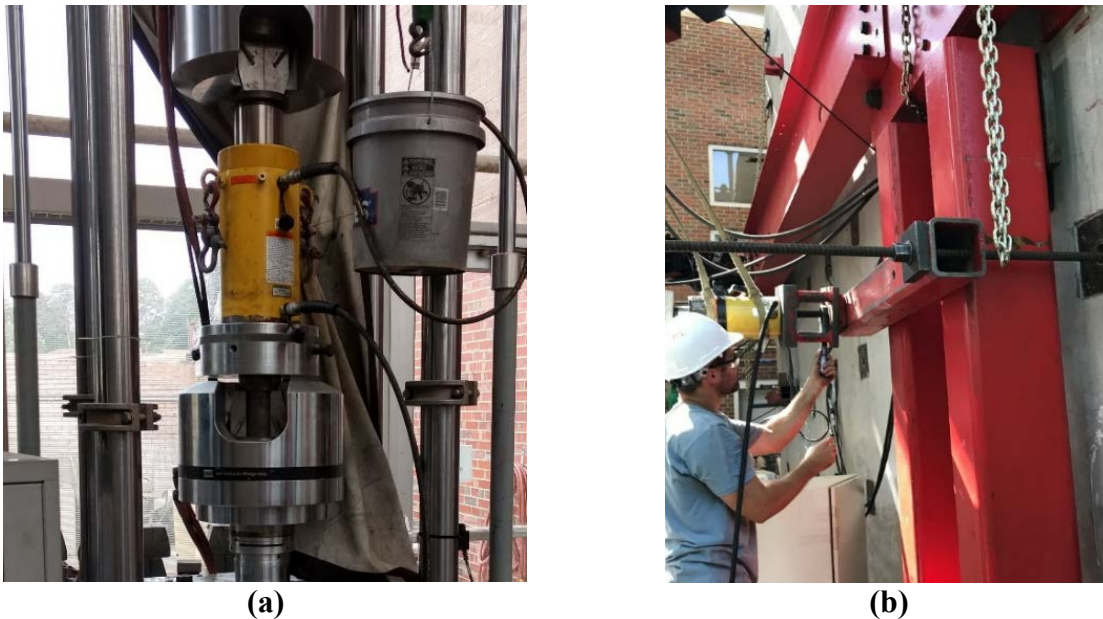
(a) 200-kip hydraulic jack in MTS Universal Testing Machine to regulate axial load; (b) Post-tensioning HSS for test setup
